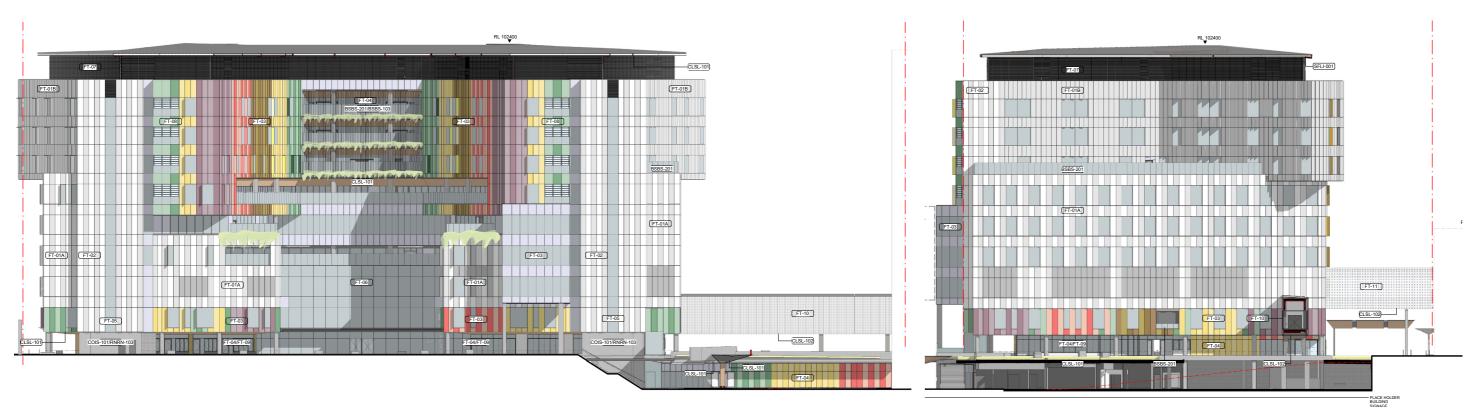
SCH1/ CCCC Elevation : High Street to Botany Street
